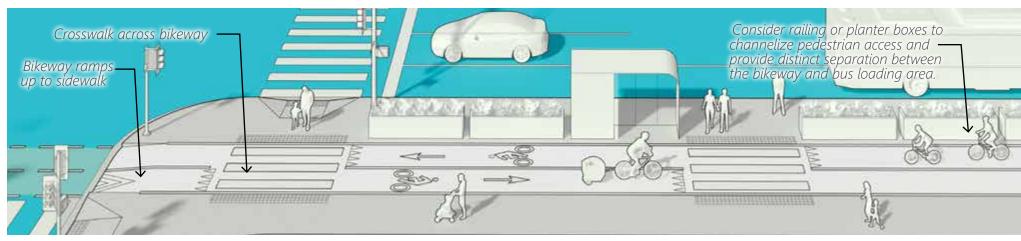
Two-Way, Sidewalk-Level, Class IV Bikeway at a Far-Side, In-Lane Loading Bus Stop.
